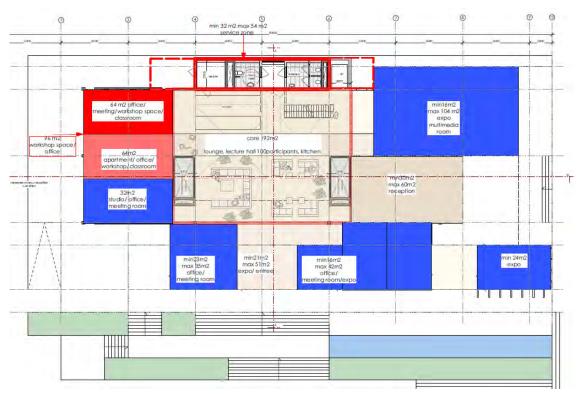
GTB Lab - ground floor core + units presenting the minimum floorplan (red units) and maximum floor plan (bleu + red units)
